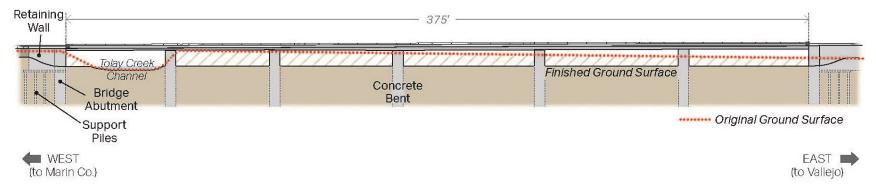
Tolay Creek Bridge Existing and Proposed Replacement – Elevation View
